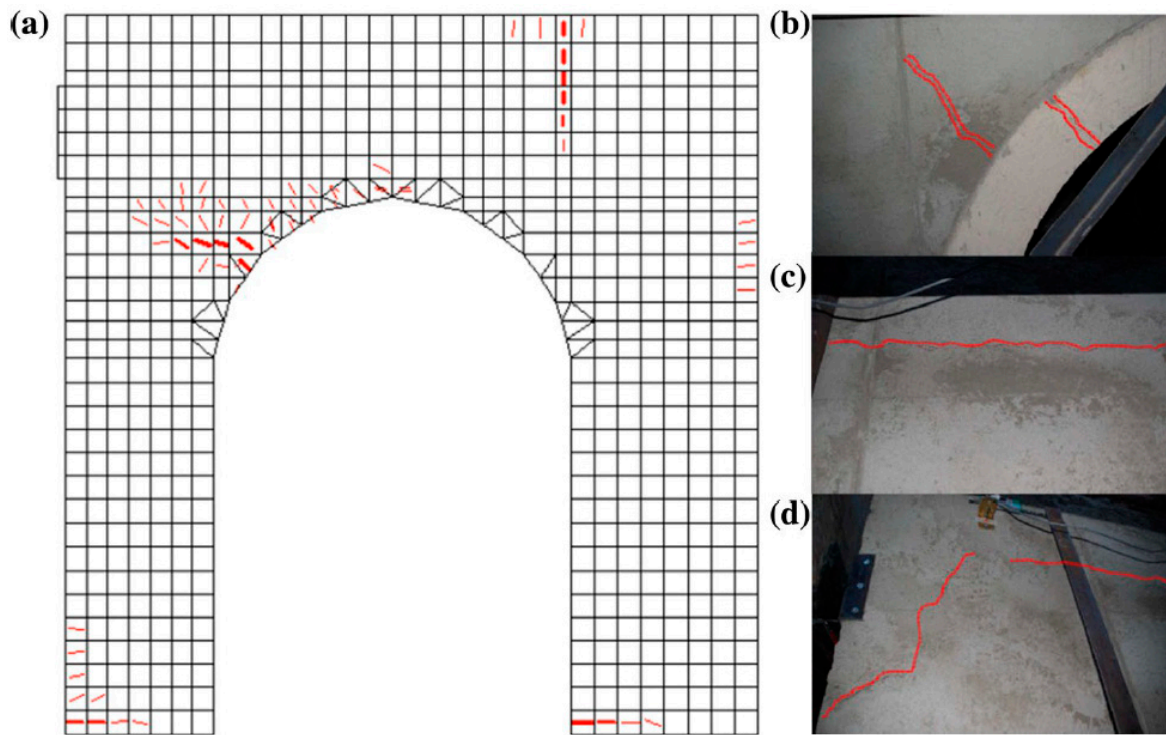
First cracks on URM wall: (a) numerical crack patterns; (b) left haunch of the arch opening; (c) long horizontal crack close to the top left of the wall; and (d) crack close to the point load.
